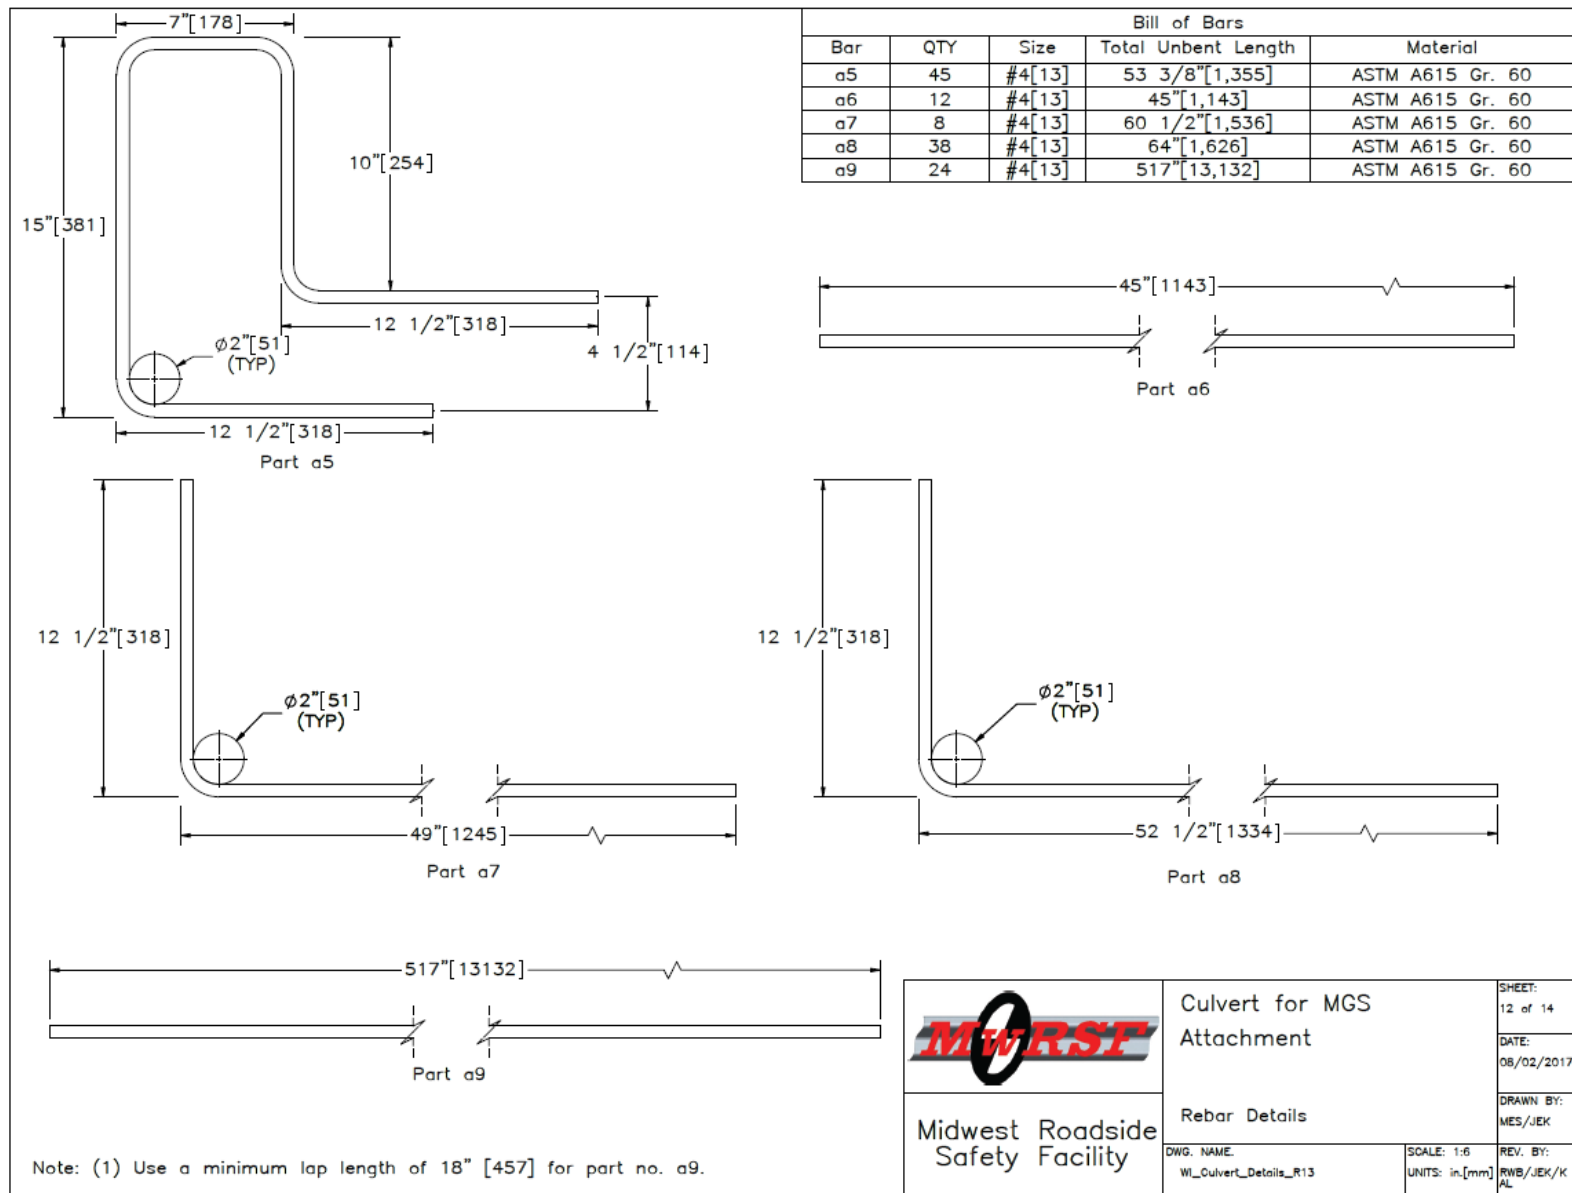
Rebar Details, Test Nos. CMGS-1 and CMGS-2
